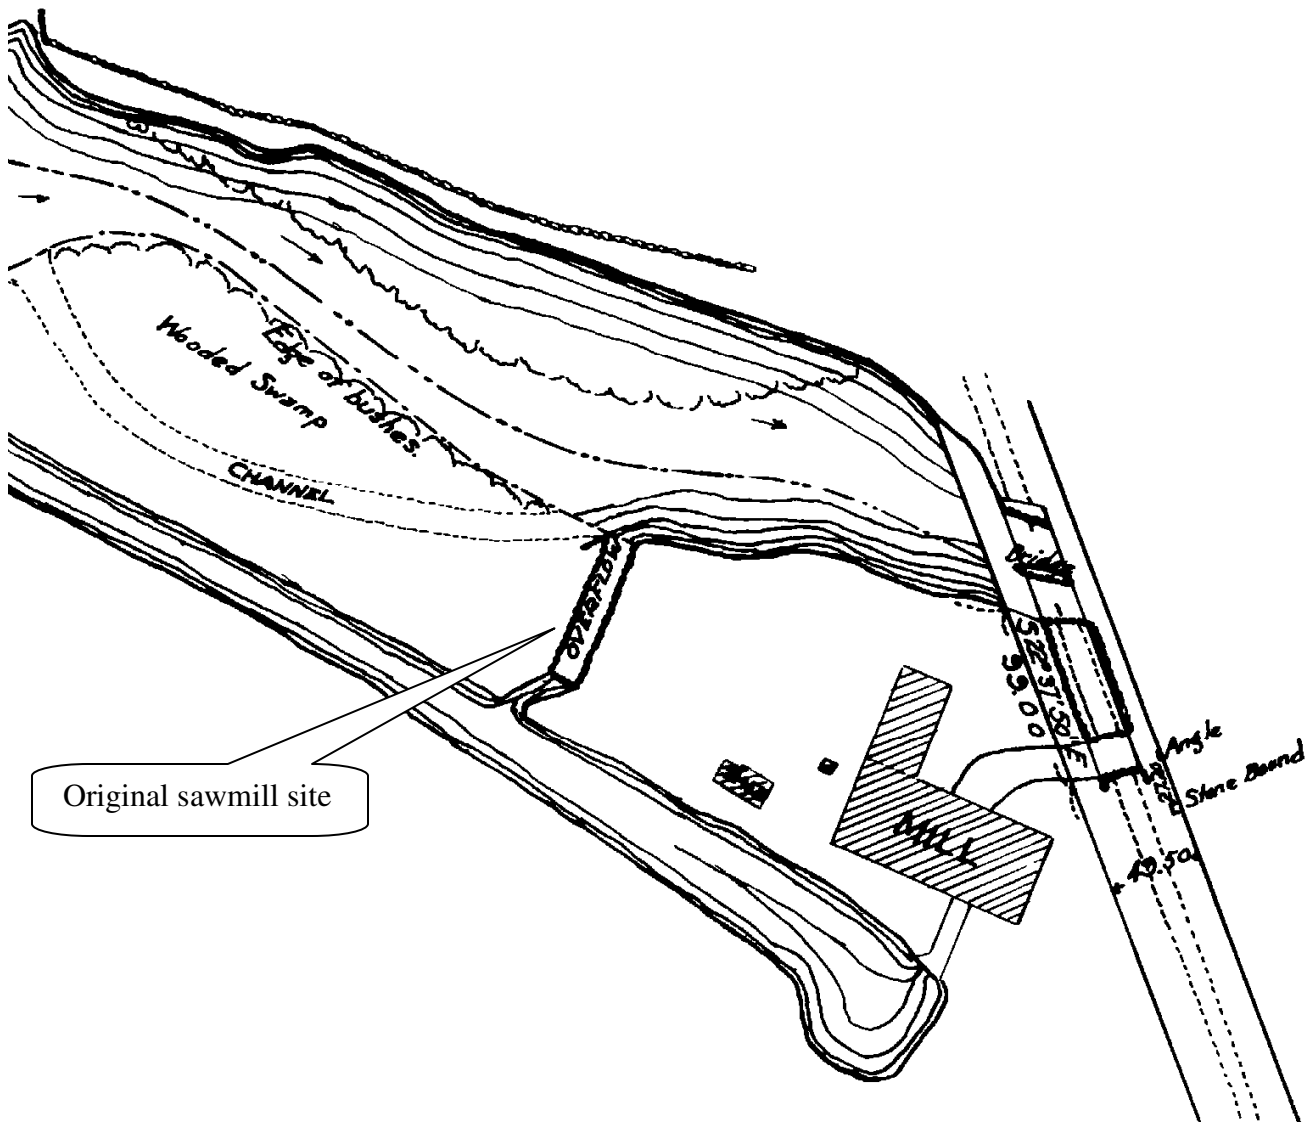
A – 1906 Survey Plan – Close-up of Mill Area
